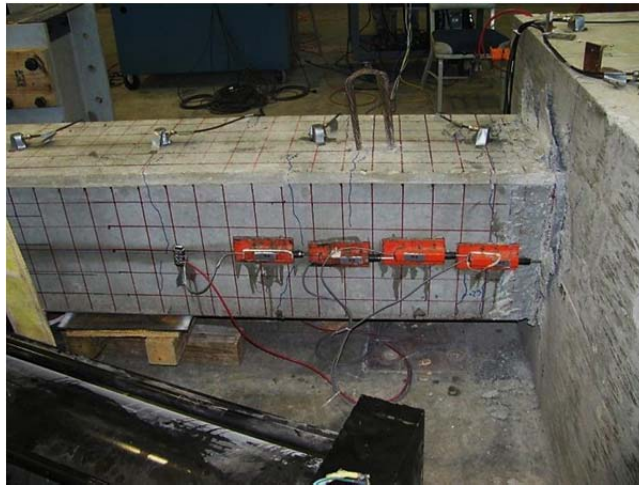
Observed Pile Damage - Specimen EB-26-1
